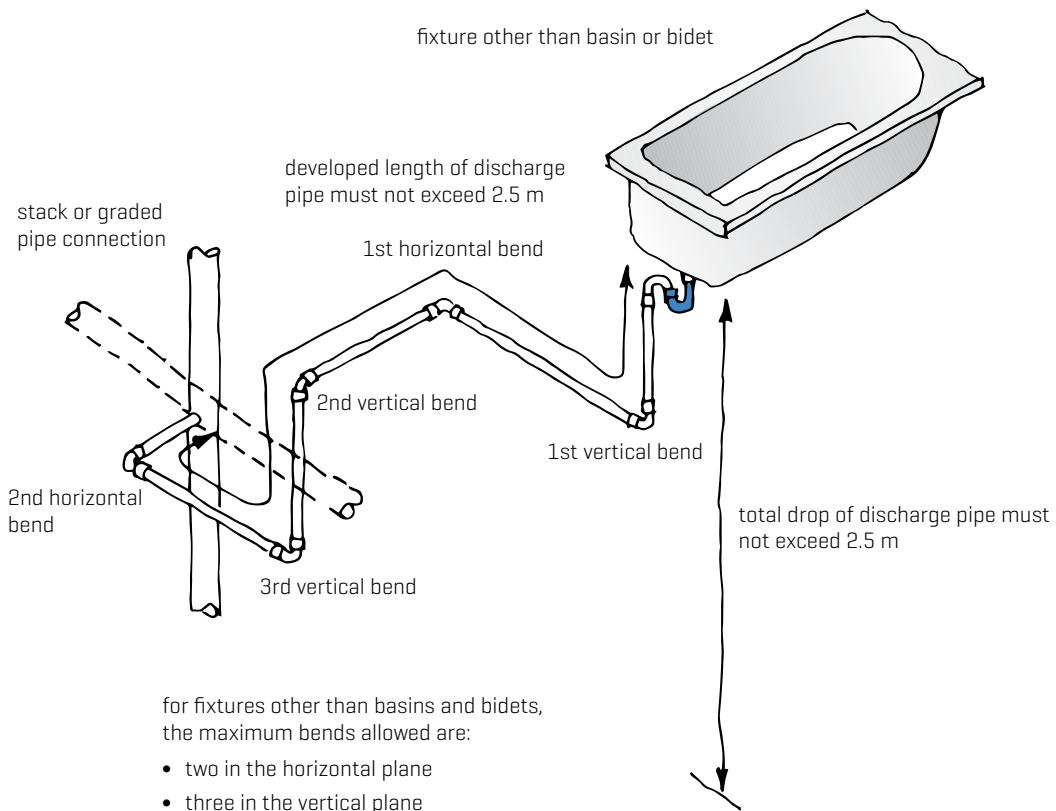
Connection of fixtures other than bidets and basins to a branch pipe or stack.
